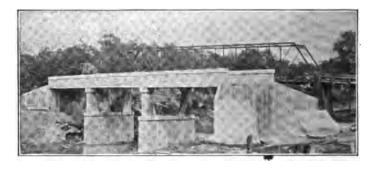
Through Girder Bridge. Three 50-ft. Spans. Illinois Highway Commission.
